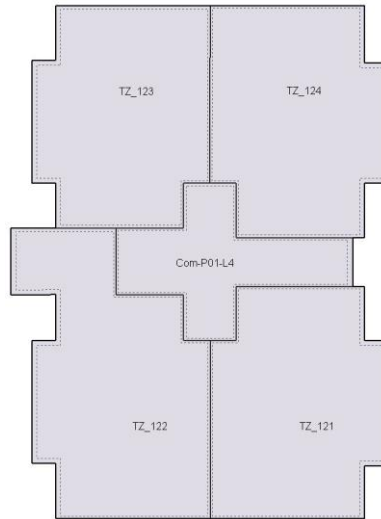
Thermal zone definition on floor 7 (3E L1 building of the Stepa Stepanovic neighborhood)
